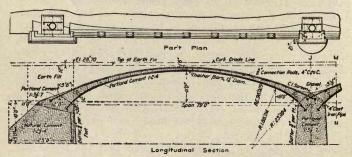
Details of 79-Ft. Span, Grand River Bridge.
